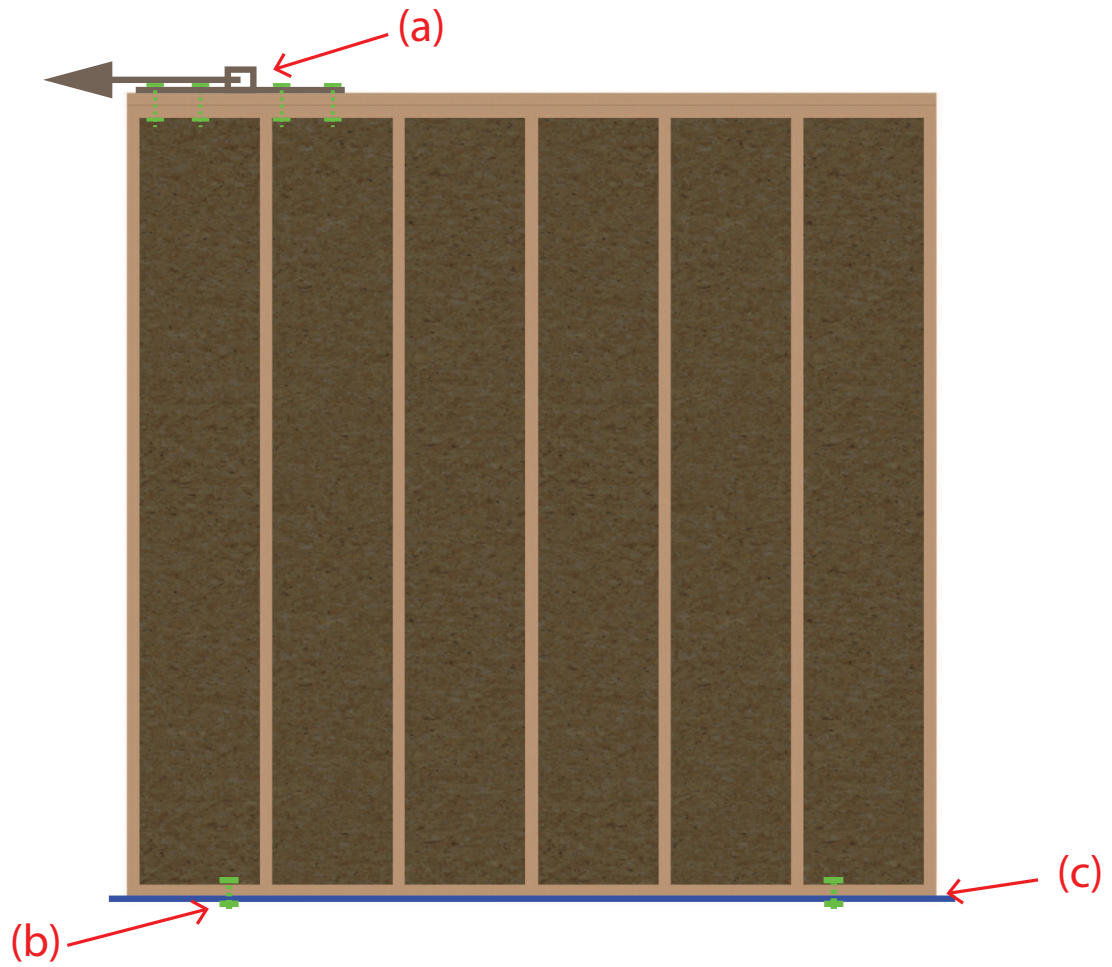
Timber wall lateral test setup: (a) bolted anchor for the loading system, (b) bolts to the rigid floor spaced at six feet, (c) rigid floor
